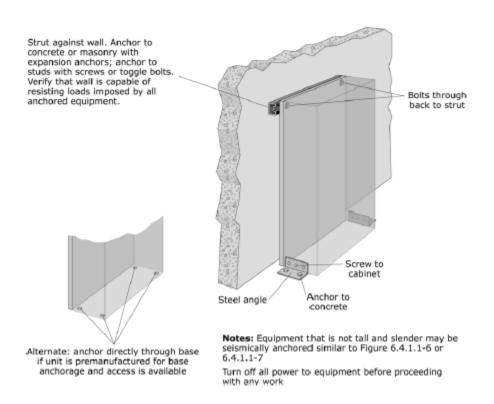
Electrical Control Panels, Motor Controls Centers, or Switchgear. (FEMA E-74, 2012, Reducing the Risks of Nonstructural Earthquake Damage)
